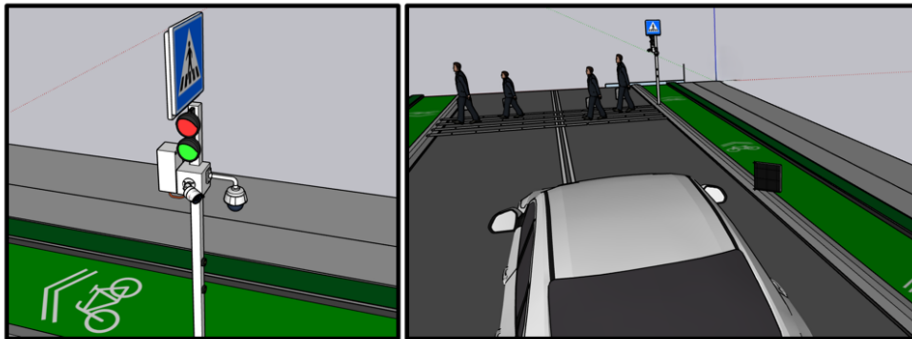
3D layout of smart crosswalk made on sketchup.
